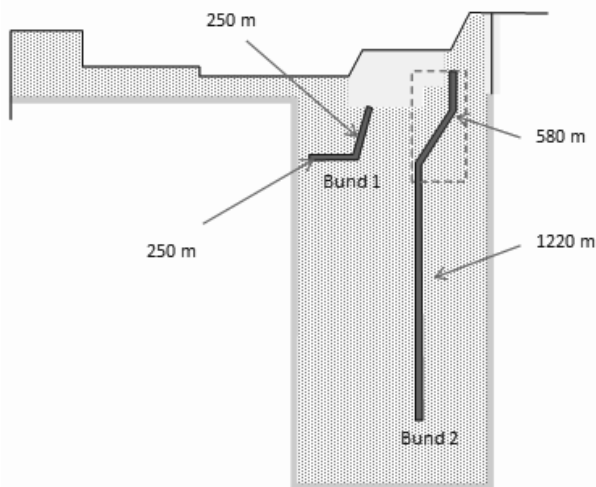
Length of geotextile containment bund 1 and 2 (Plan view)
